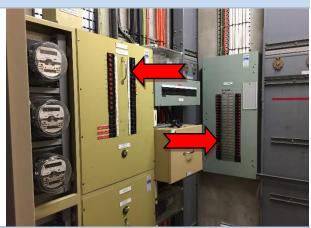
Interior: levels 1 to 6, electrical server room, switchboard – suspected asbestos containing arc shields.
